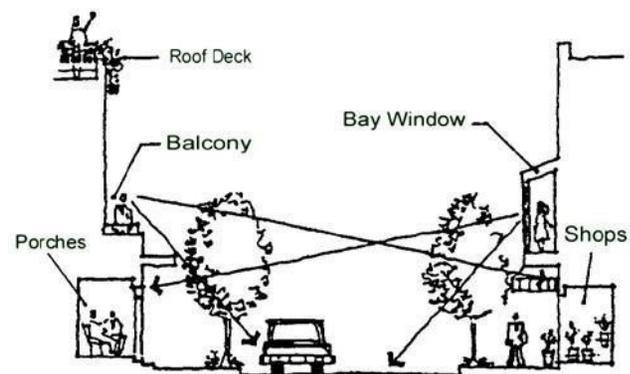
Building elements can enliven the street edge creating safer places to walk and congregate.
